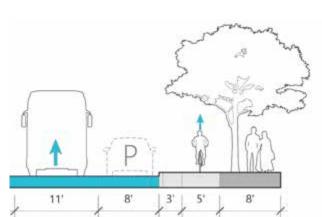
Bus on an Typical Arterial Street with a One-Way, In-Street Class IV Bikeway.
